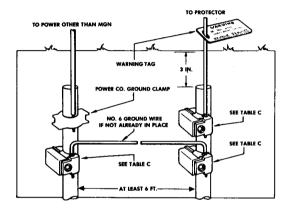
Power Other than MGN Grounded to Ground Rod—No Water Pipe
